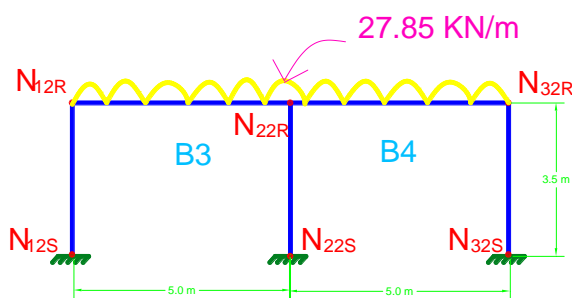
Substitute Frame -2 for the Terrace Floor Beam B3 - B4 (TSF2)
